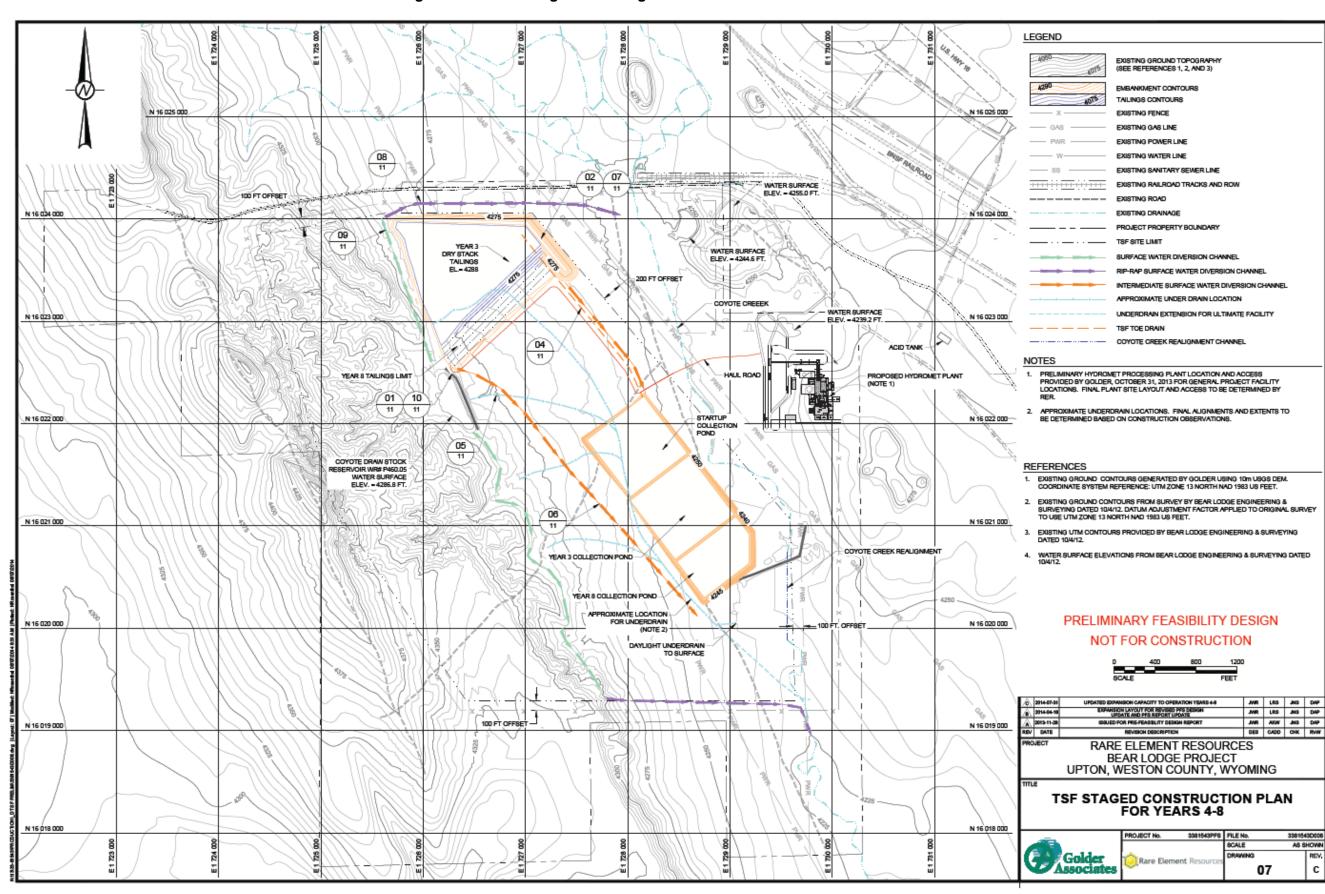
Drawing 07 TSF Staged Construction Plan for Years 4 – 8
